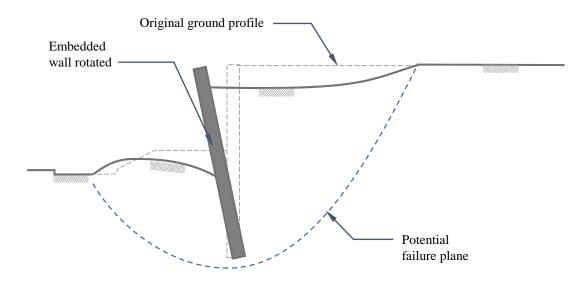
Failure by Overturning for a Cantilevered Wall
